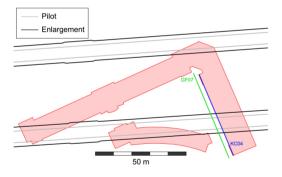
Layout of piled building KC in relation to station tunnels on Crossrail project.
